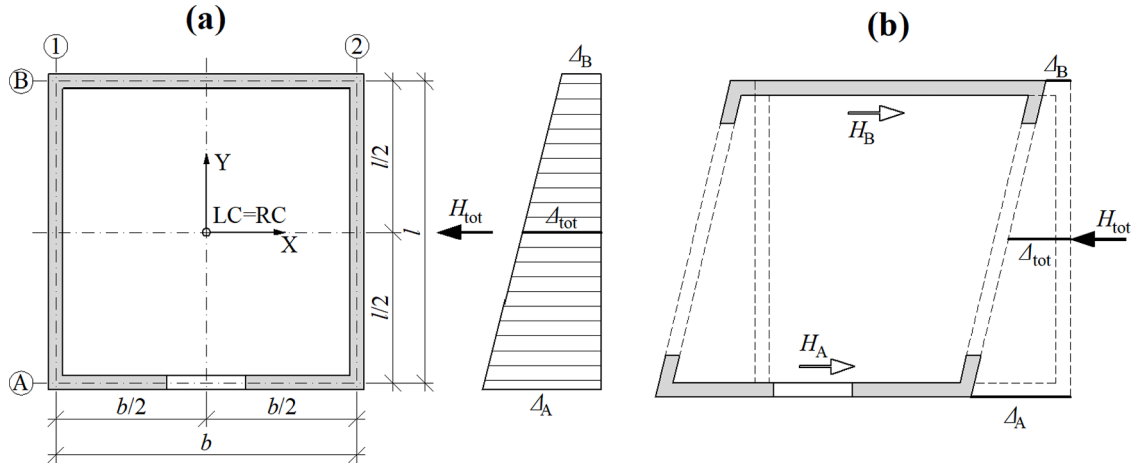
A graphical representation of the empirical method for determining internal forces in stiffening walls: (a) layout of the building, (b) deformation of the building.
